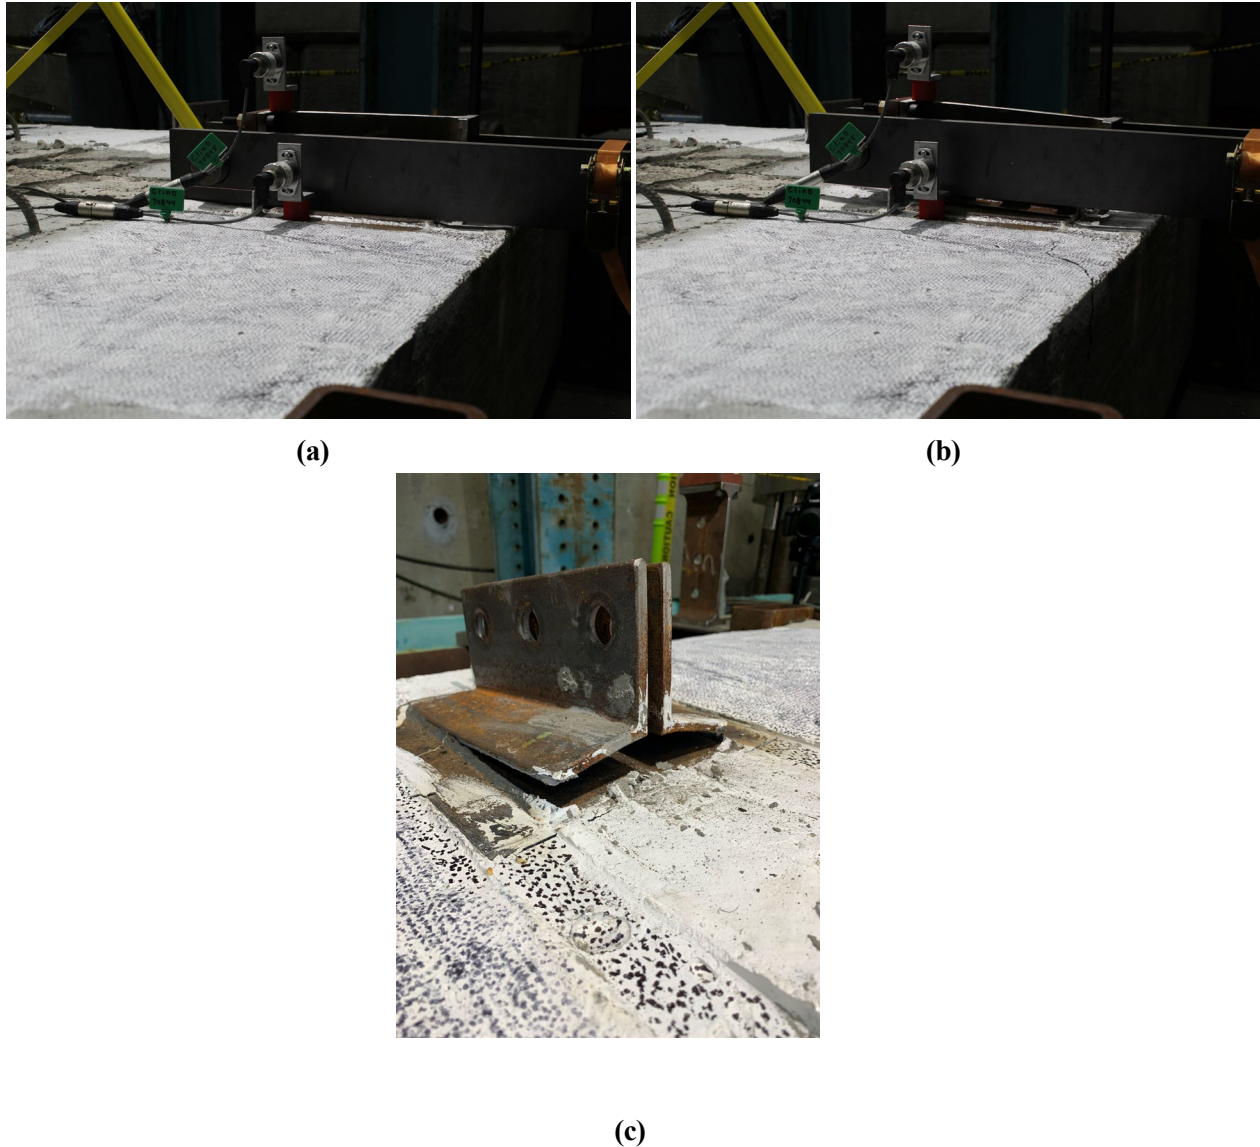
Side view of DA-250^P (a) at the beginning of the test, (b) just before weld rupture, and (c) weld rupture on the angle connection
